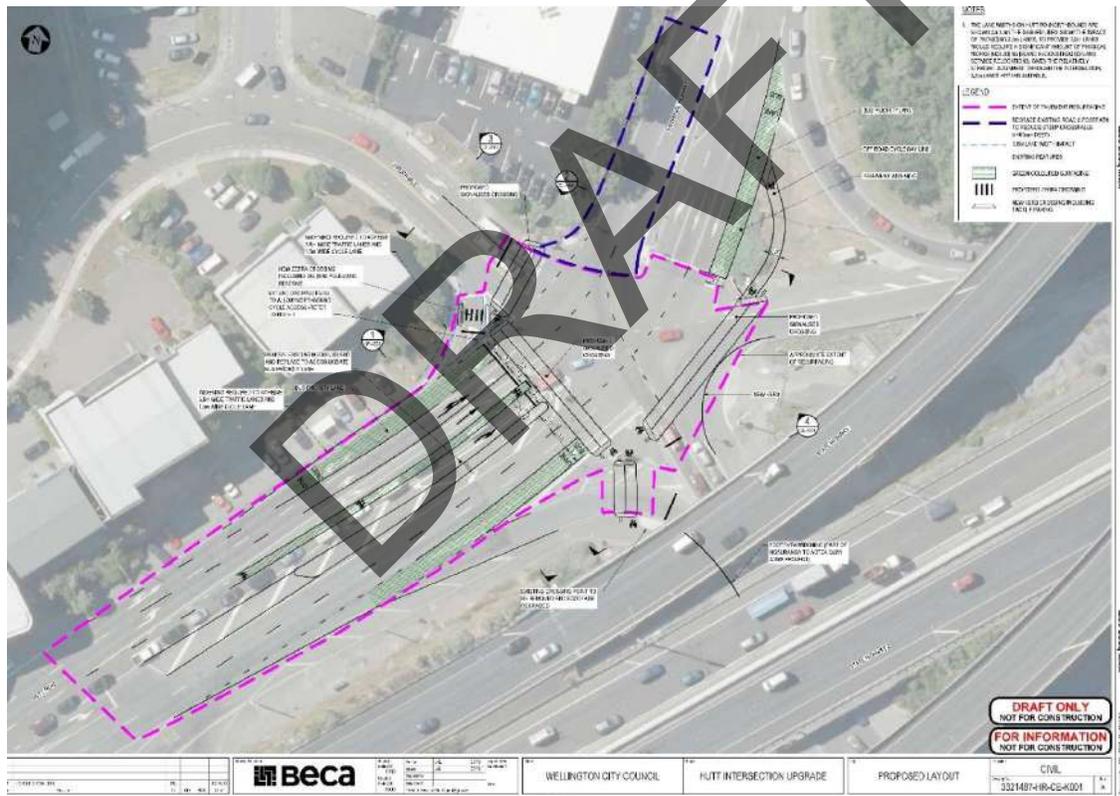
Specimen Design Diagram of the Hutt Road / Jarden Mile Intersection
